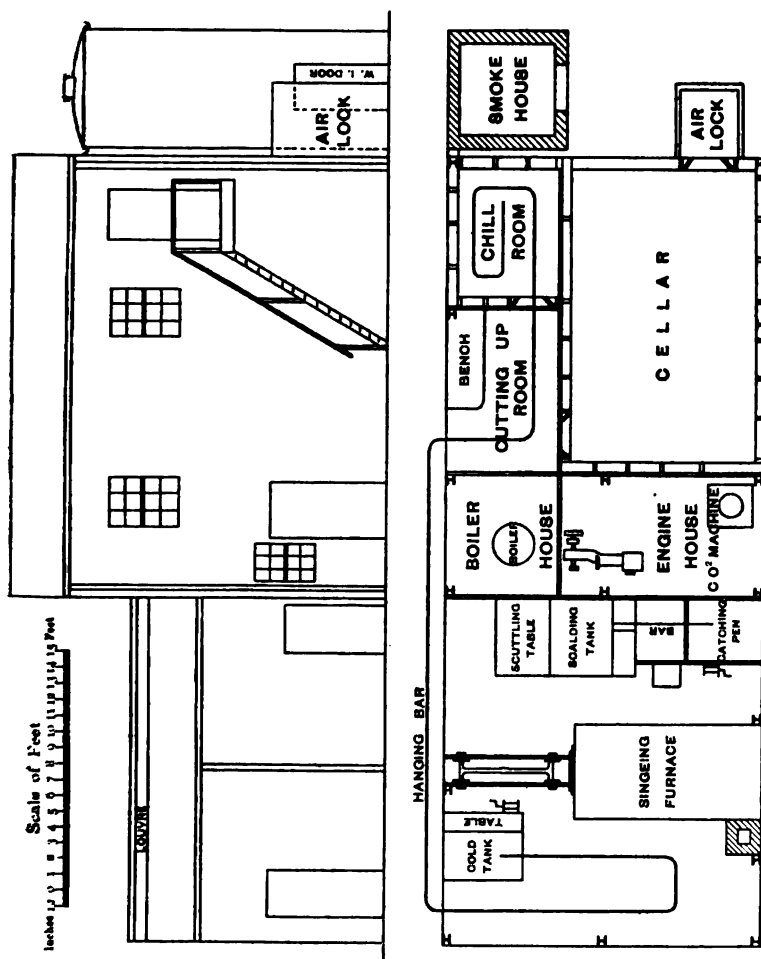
Ground plan and front elevation of bacon factory for 50 pigs per week.
